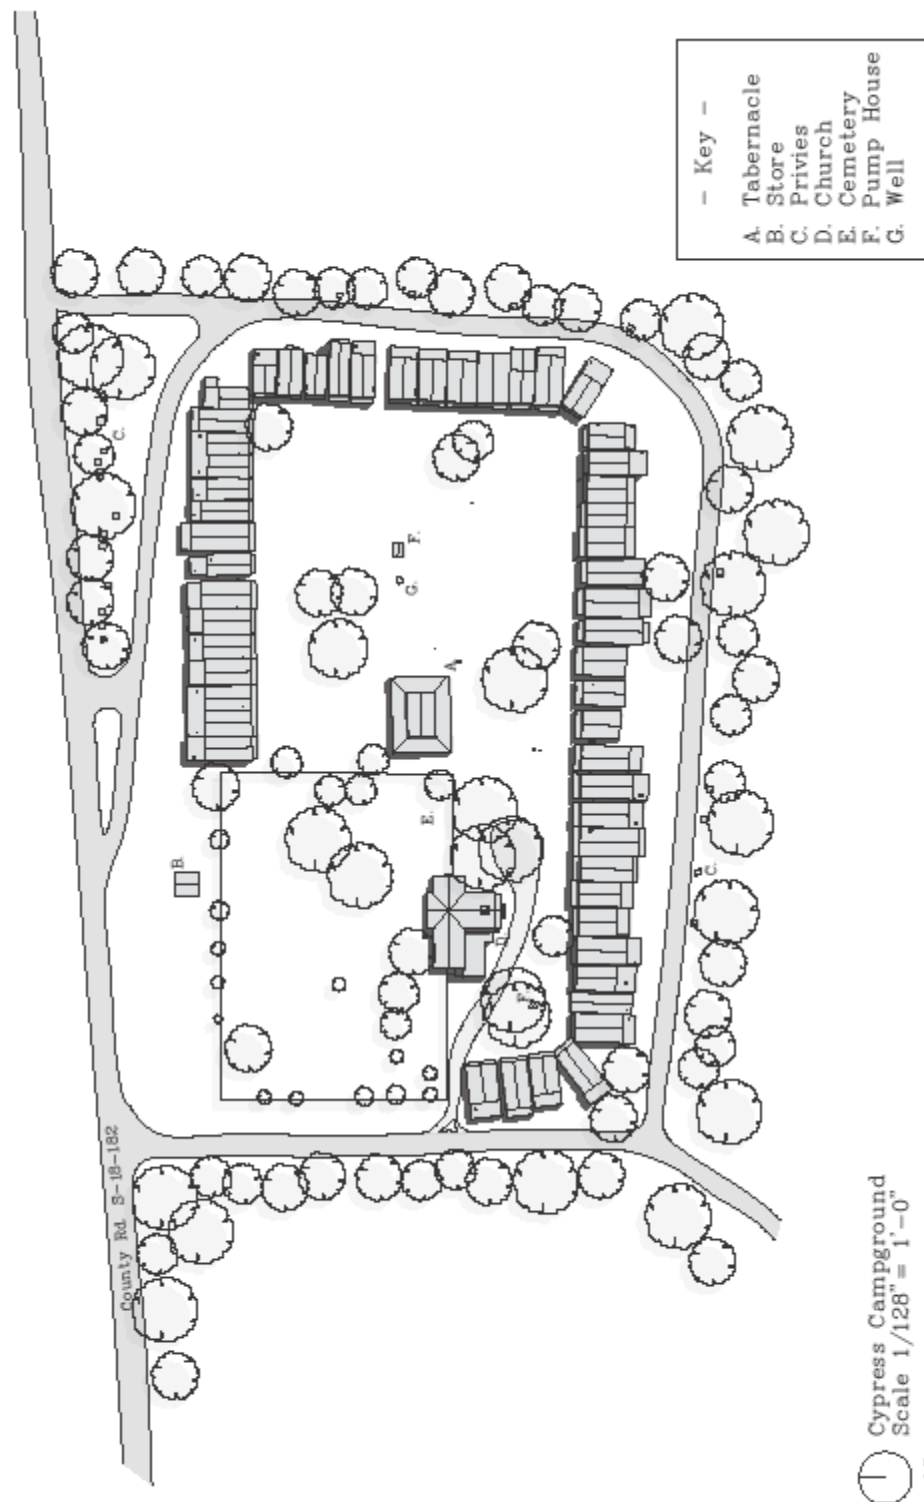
Site plan of Cypress Campground. Illustration by author.
